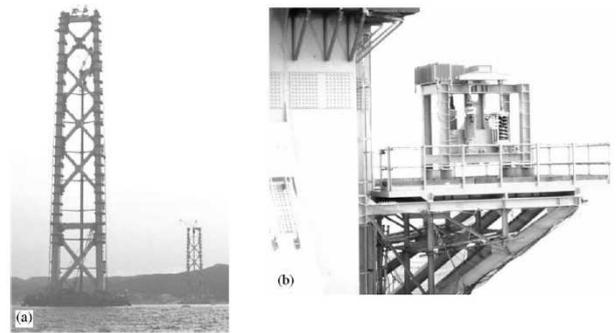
Installation of vibration control devices in the Akashi-Kaikyo Bridge, (a) free standing tower of 300m high, (b) a set of active damper system applied to erection stage only.
